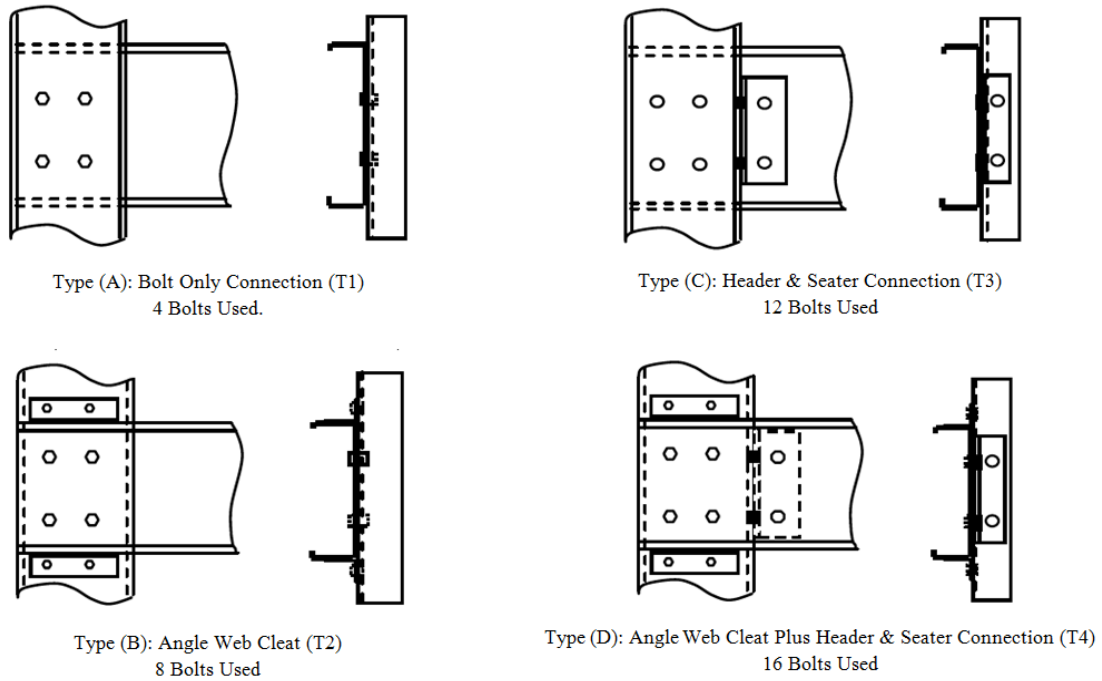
Connection configuration of cold-formed steel structure beam to column connection by Ahamed and Mahendran (2010)
